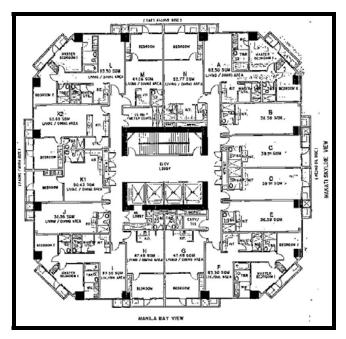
Robinsons Place Residences, Ermita, Manila, Philippines -Typical Floor Plan⁸⁷
